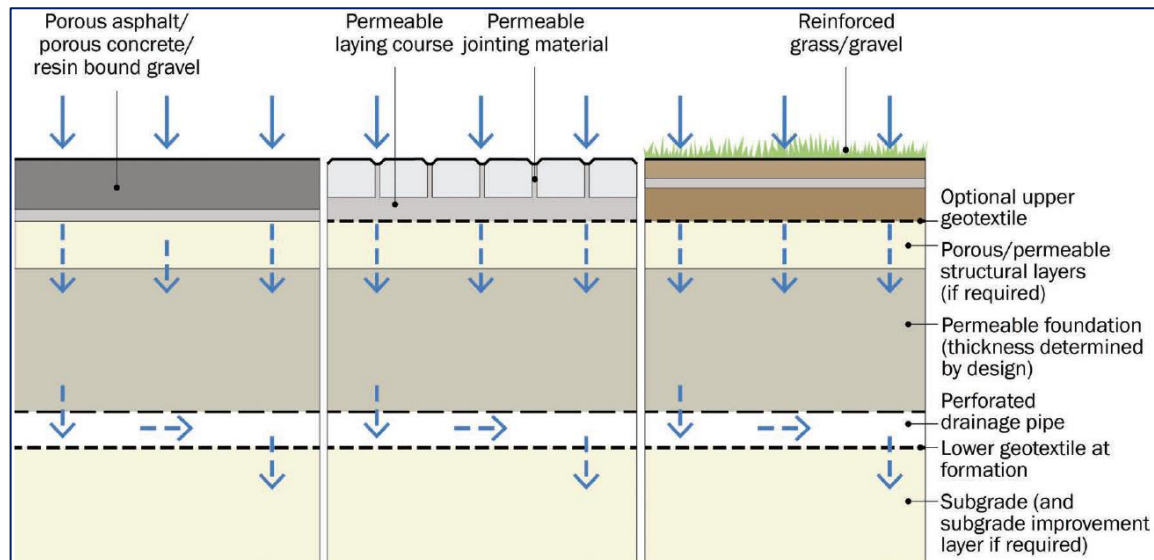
Detail of Type B Pervious Paving (CIRIA C753)
